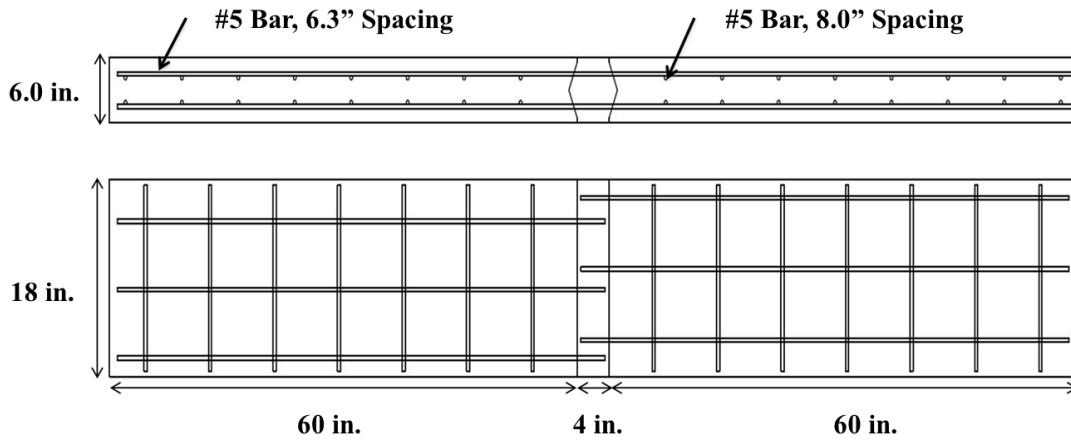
Construction and Reinforcement Details for Precast Decks with UHPC Joint
